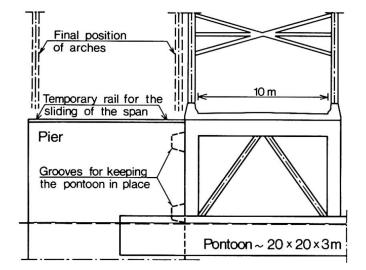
Pontoon and pier with the span on the pontoon ready for transfer.
